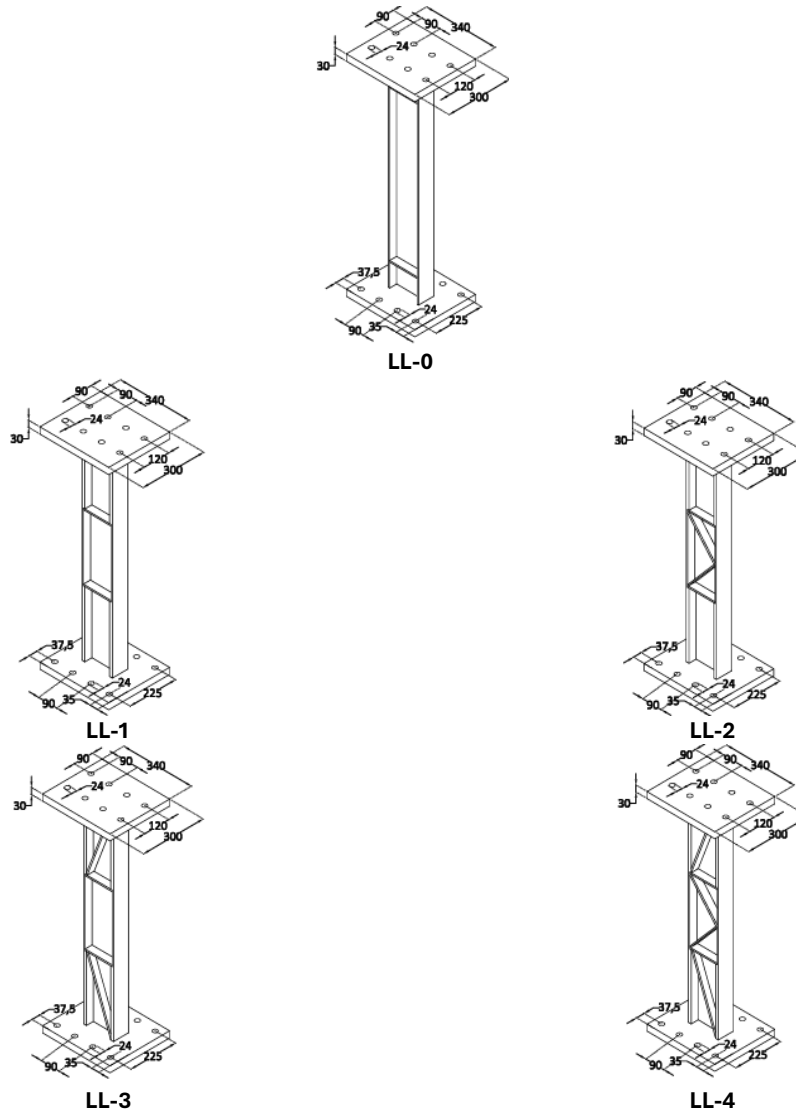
The constructed dimensions for testing specimens with an endplate (Isometri)
